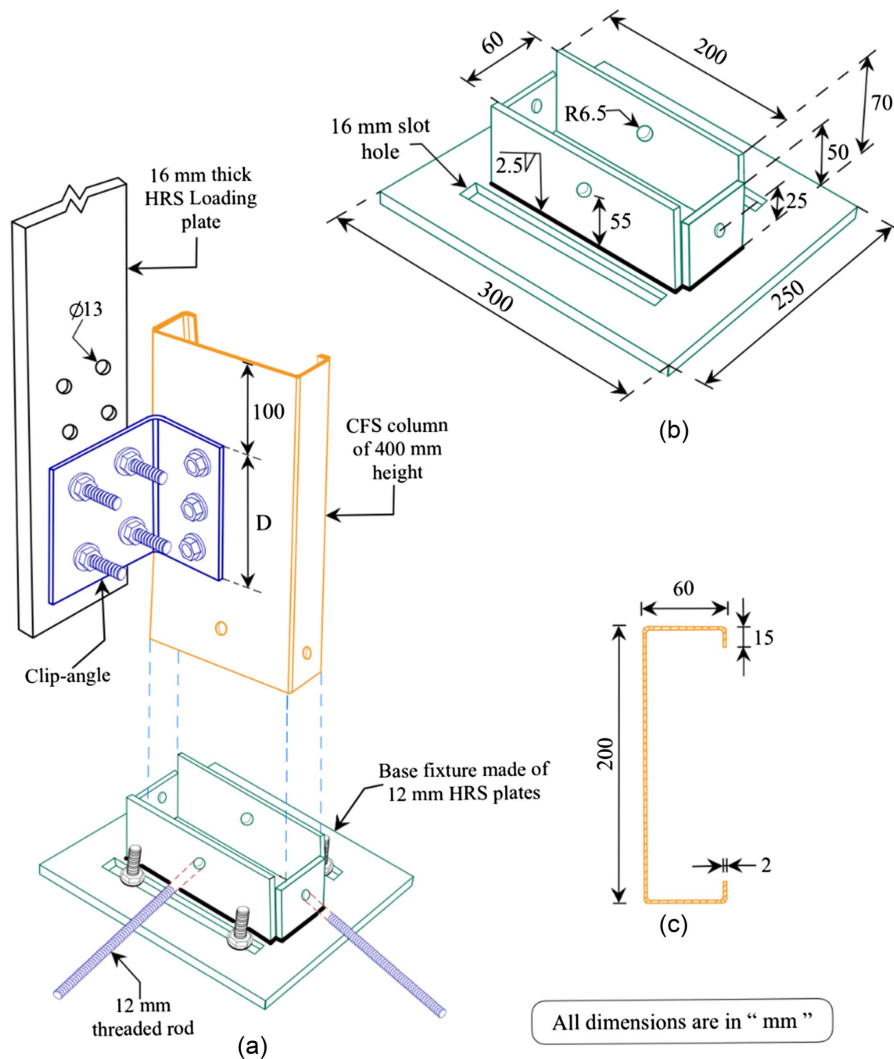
Test set-up details: (a) installation of test specimen into base fixture; (b) base fixture for column; and (c) cross-section of CFS column.
